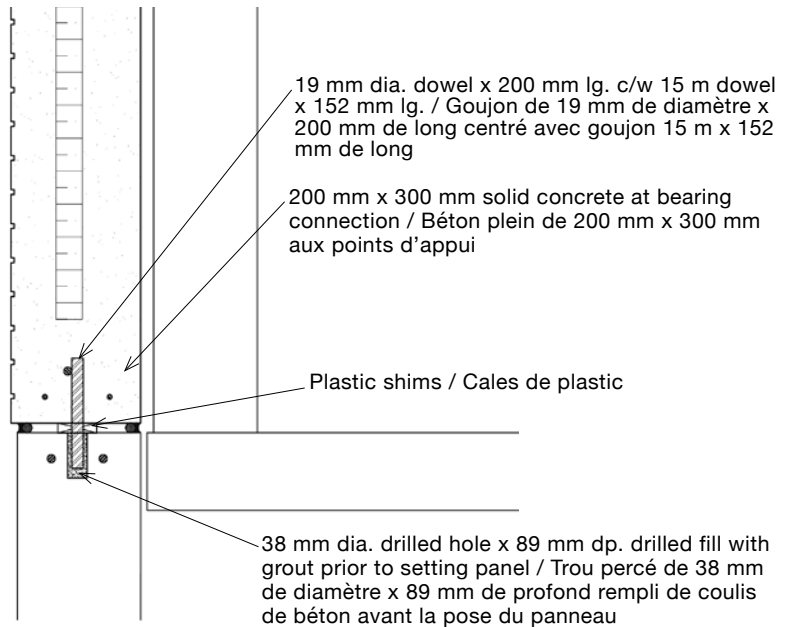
Detail A: Connection of precast concrete wall to roof parapet / Détail A: Connexion du mur de béton préfabriqué au parapet du toit
